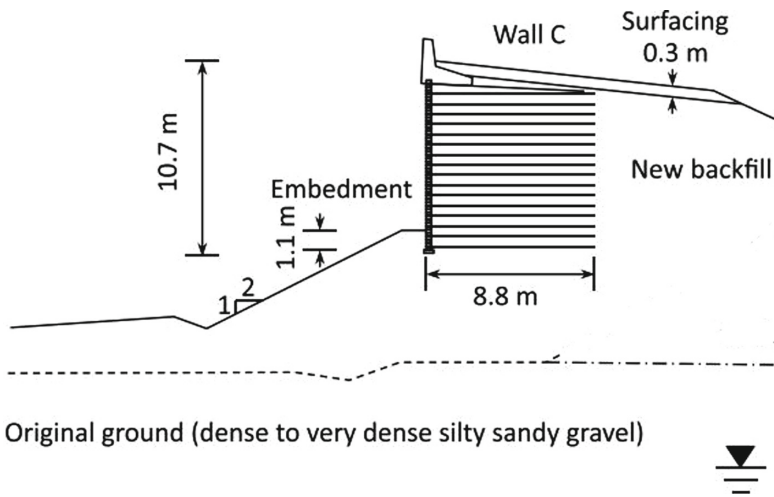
Cross section view of wall C (adapted from Yu et al. 2016)
